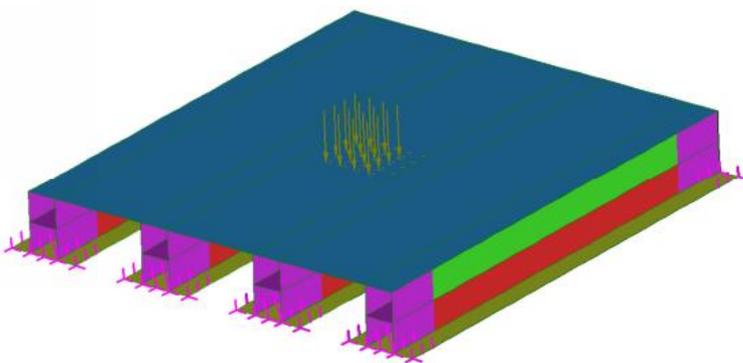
Test 2: Strand7 FEA Model – GFRP rebar/concrete capacity and associated test rig
